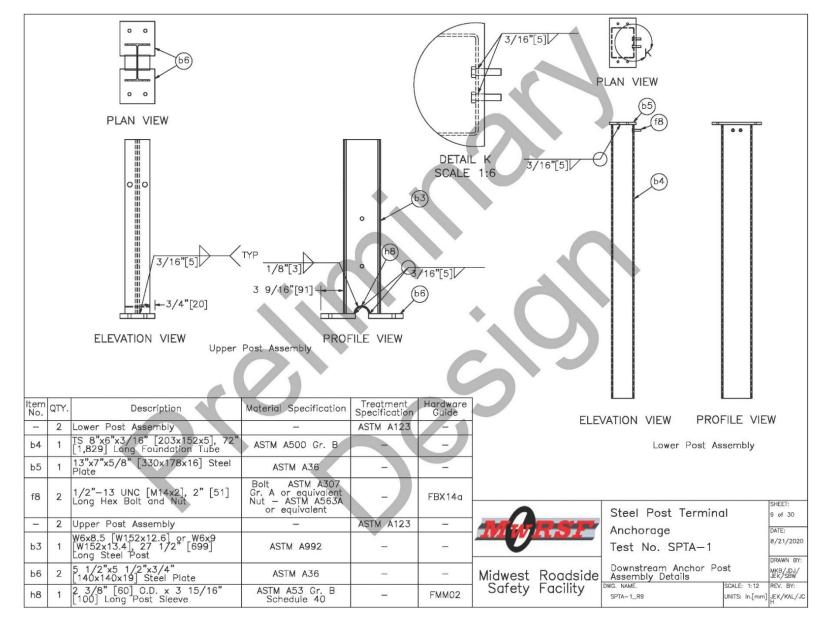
Downstream Anchor Post Assembly Details, Test No. SPTA-1
